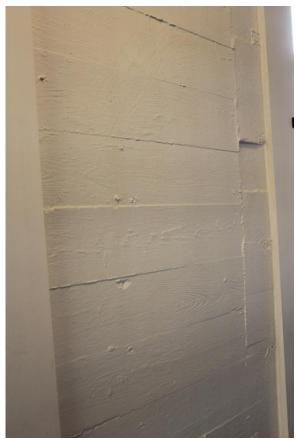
, Old Jail, First Floor, Room 101, detail view of the poured-in-place concrete east wall between the two windows.
